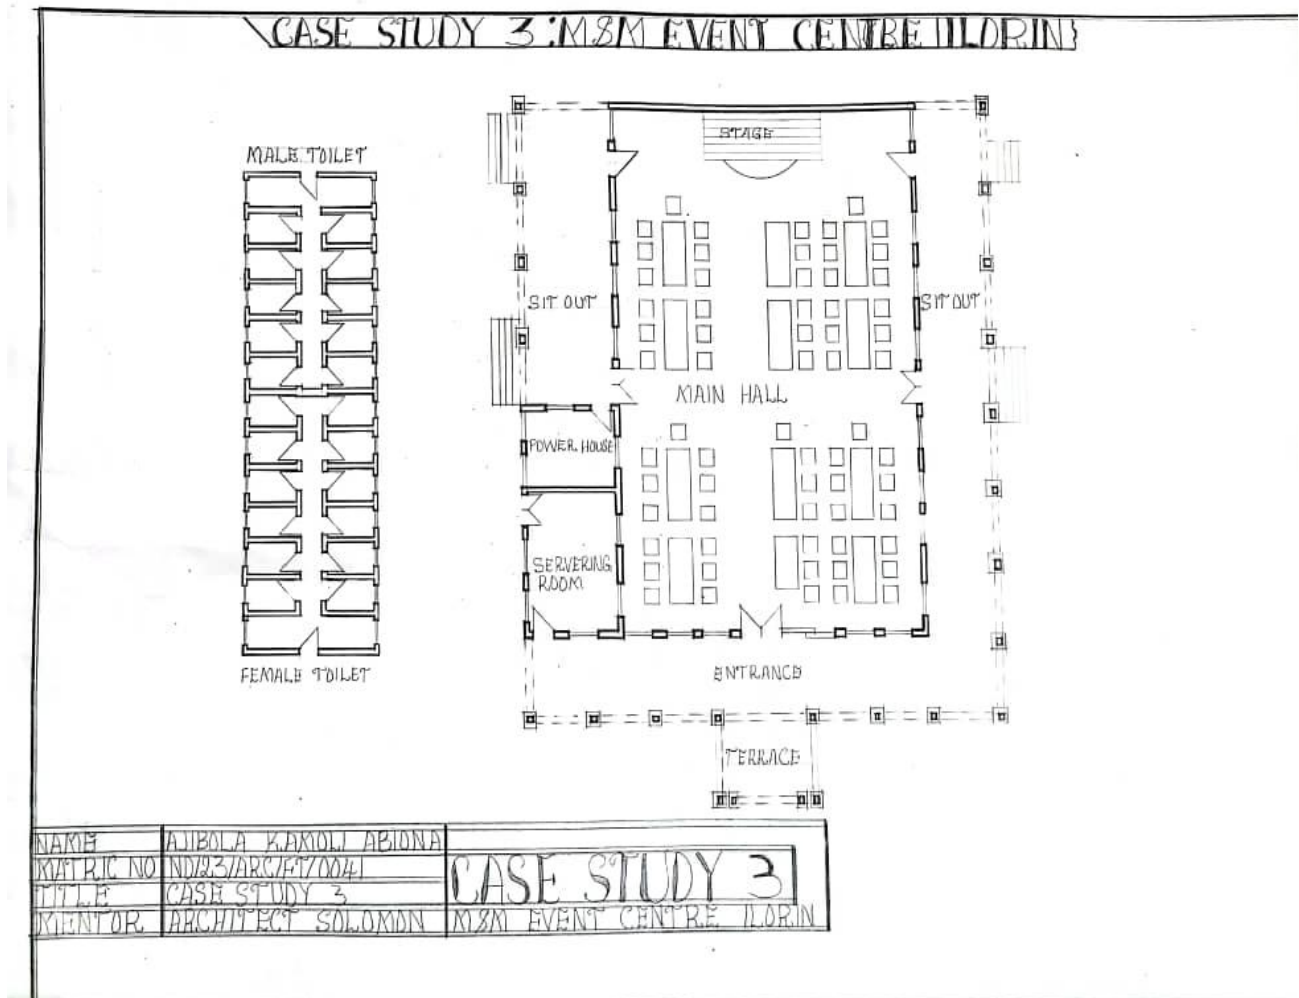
SHOWING THE FLOOR PLAN OF THE CASE STUDY THREE
